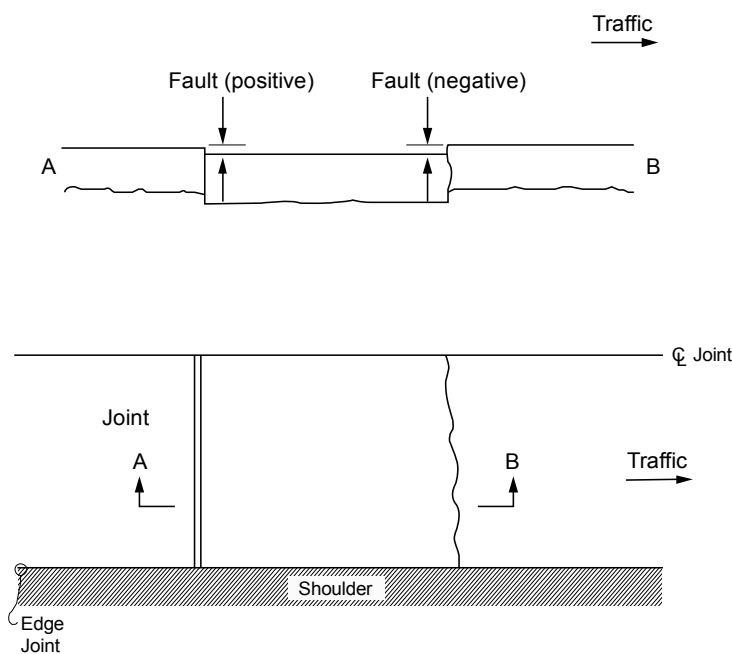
Faulting of Transverse Joints or Cracks (See Section 10.1)
